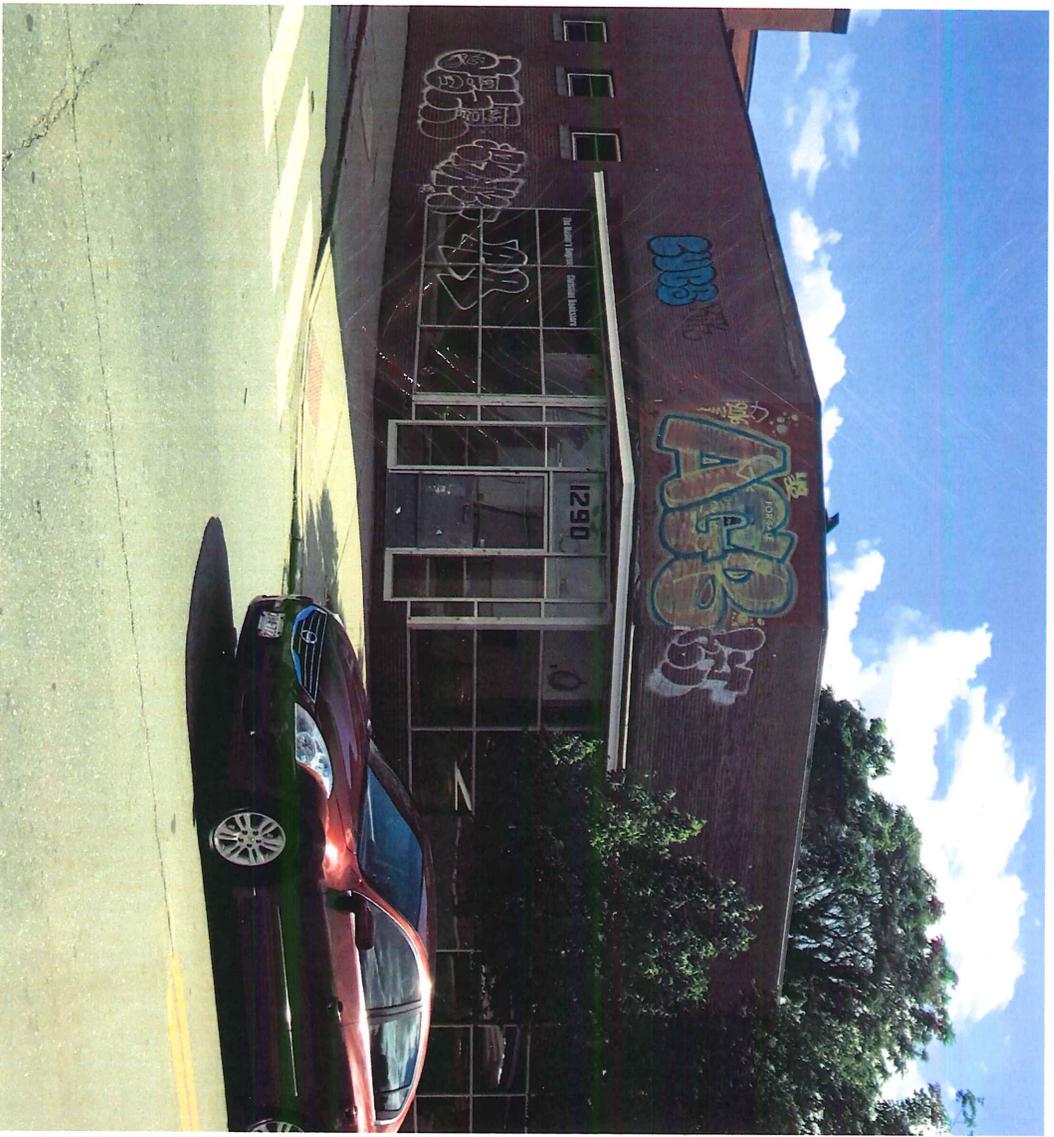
Carpenter Street (16 spaces for parking for 1292 Westminster Street proposed building):
